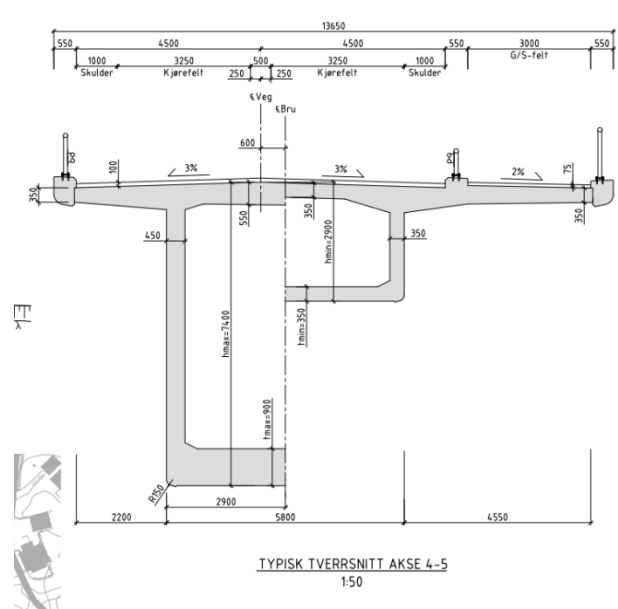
Cross section of the new suggested Kjøkøysund bridge [72]
